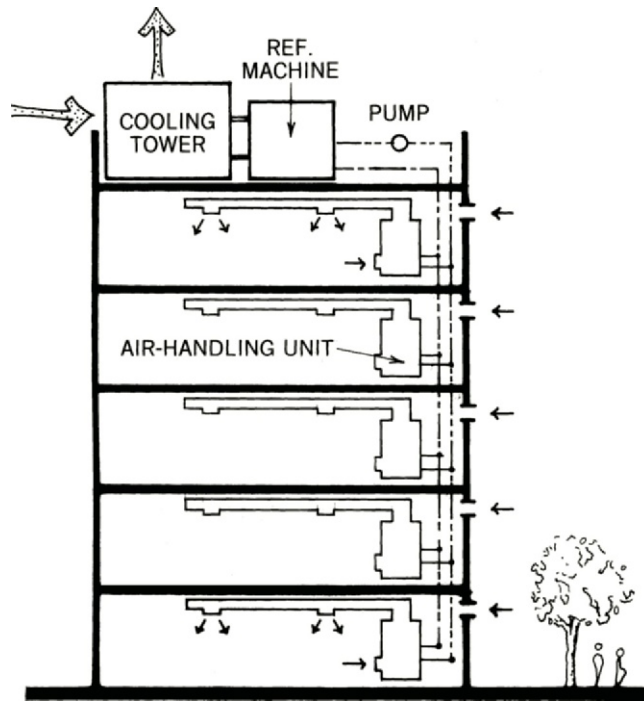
This section shows an alternate approach. Although much of the mechanical equipment is still on the roof, each floor has a separate air-handling unit. Because the refrigeration machine is now producing chilled water, it is called a chiller.
